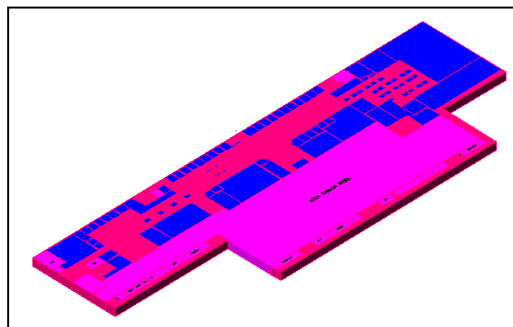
Solid* 3D shape of Blok M mall building at B2 floor
